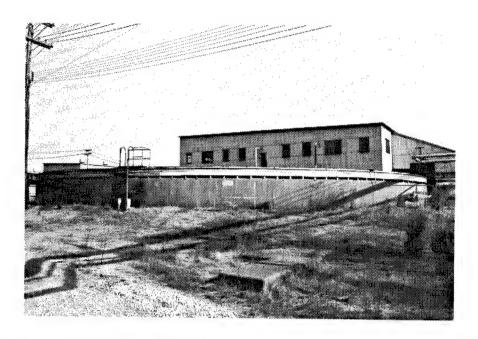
Building 120-5: Save-All Tanks for the Pulping, Poaching, and Blending Houses.
